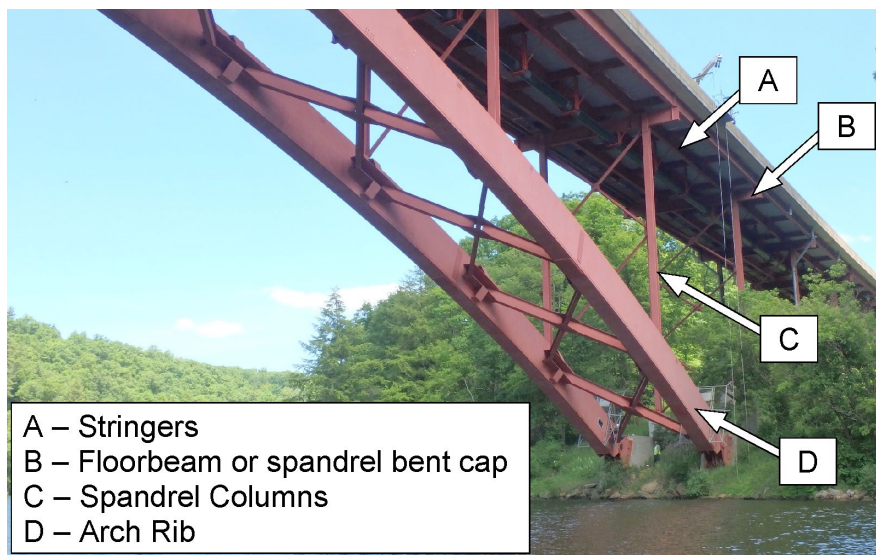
Solid Rib Deck Arch Primary Members
